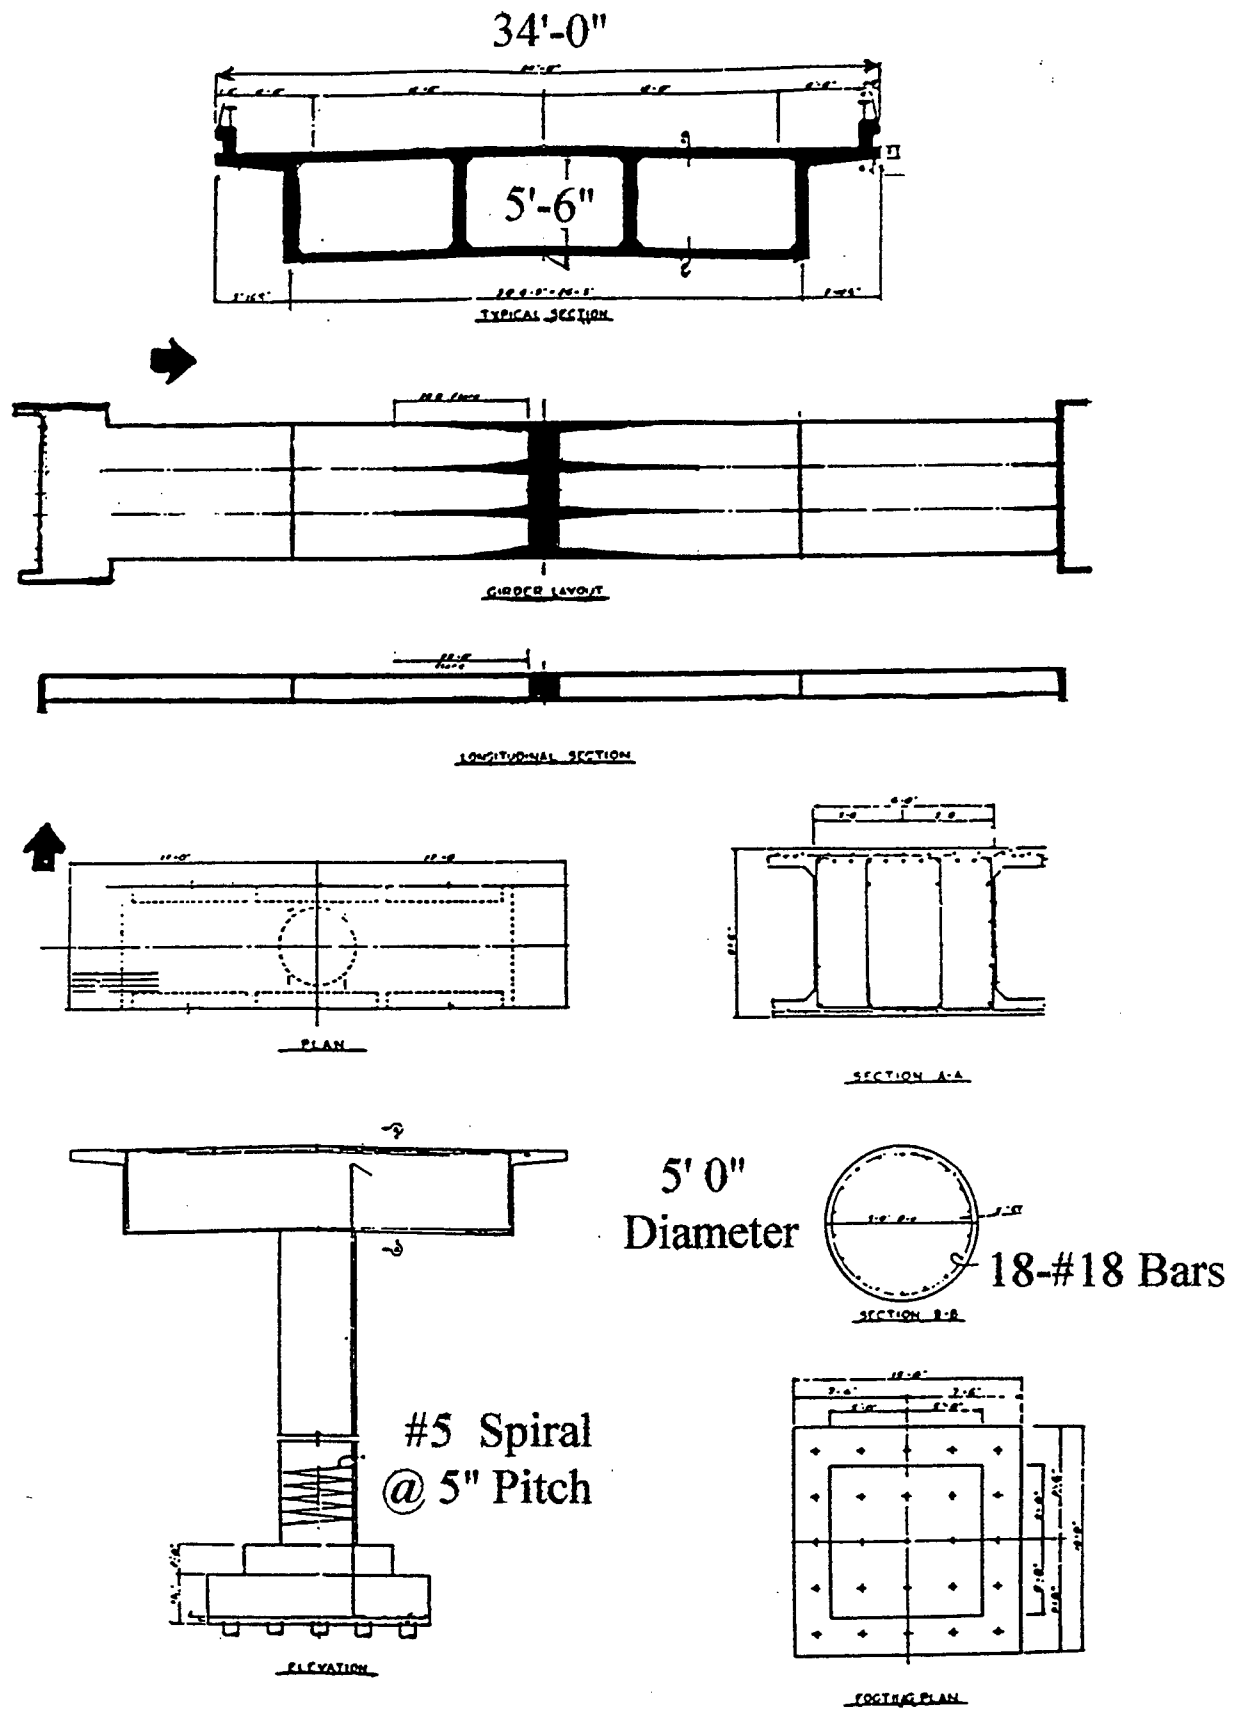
MRO Deck and Central Pier Construction Details
